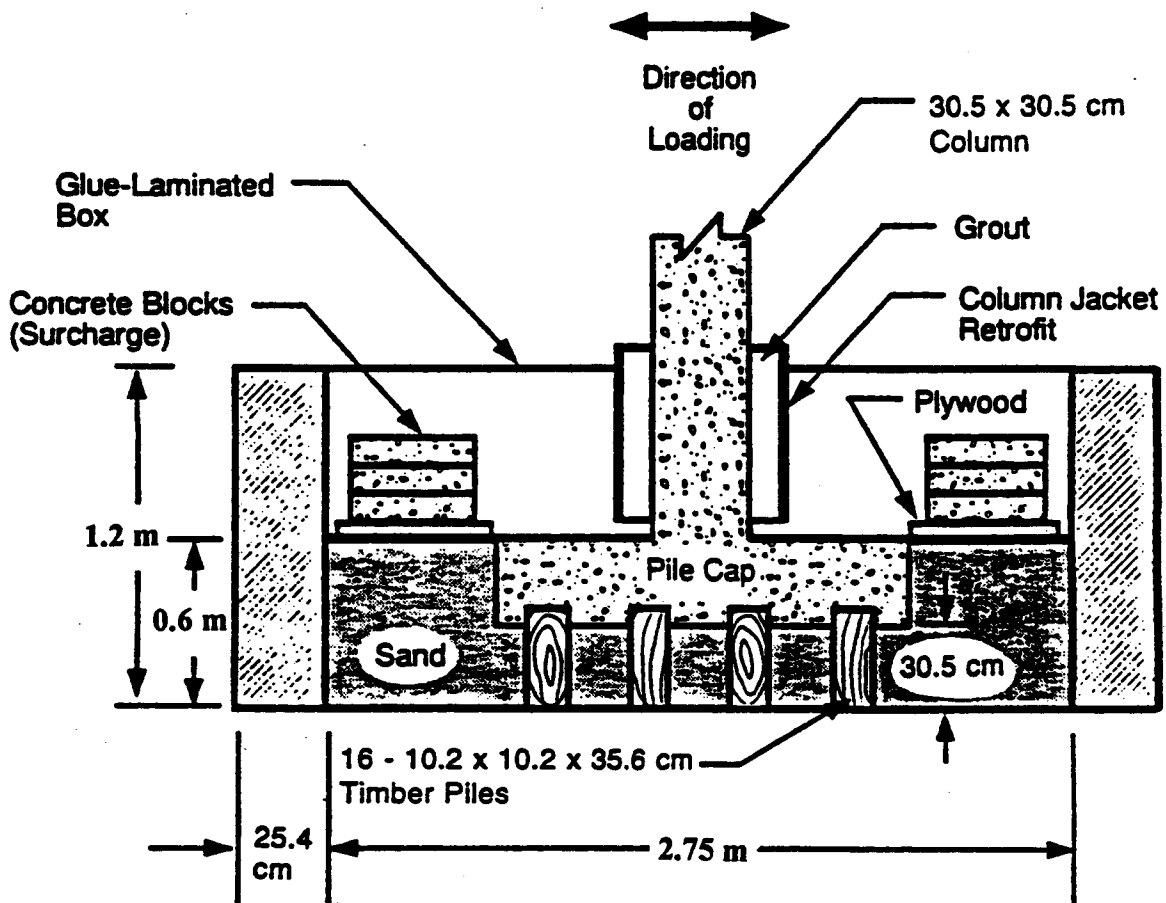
Testing Support Conditions for the Pile-Supported Specimens
